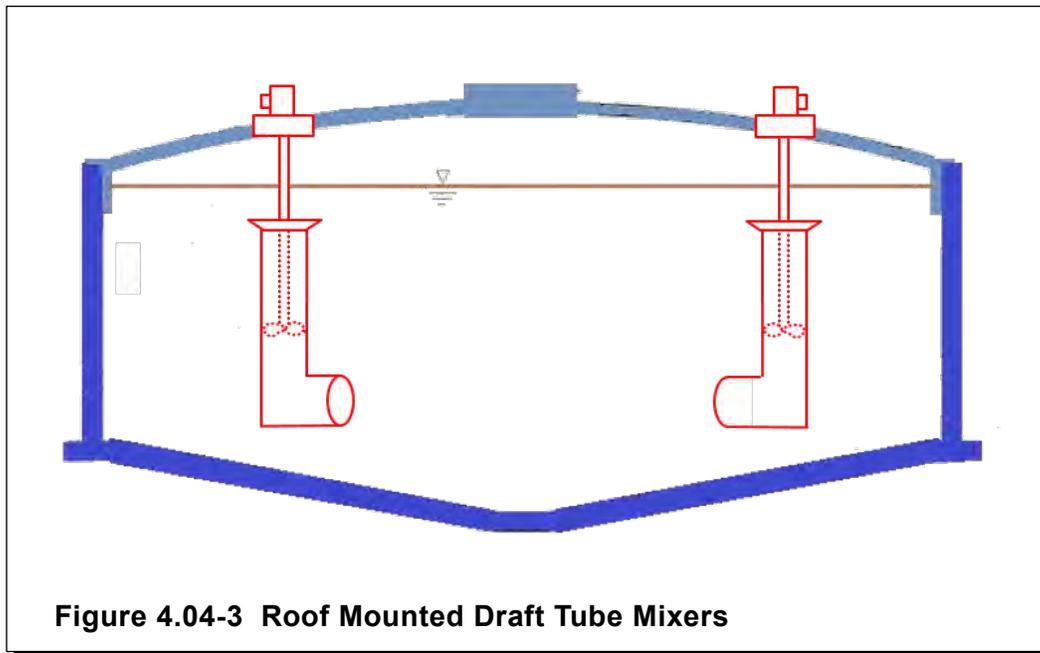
Roof Mounted Draft Tube Mixers
